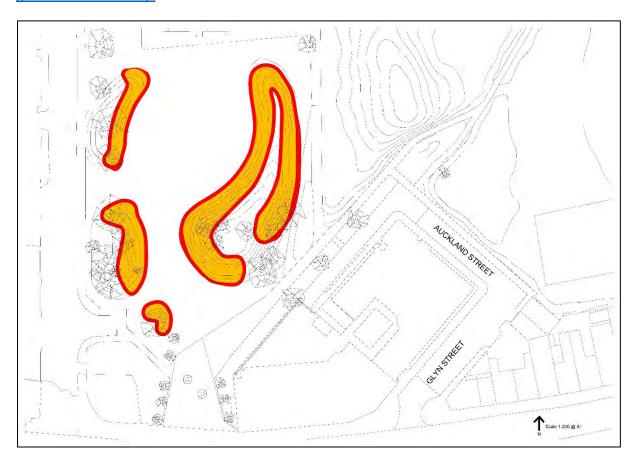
Plan for the 'Bulb Valley' project in Vauxhall Pleasure Gardens, showing the location of areas to be planted with flowering bulbs (LB Lambeth/FoVPG)
